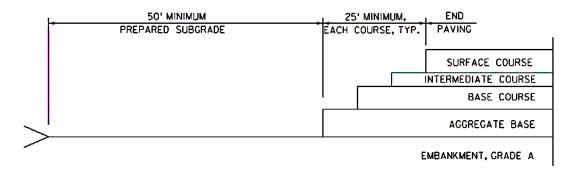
23: PARKWAY LONGITUDINAL PAVING INTERFACE
